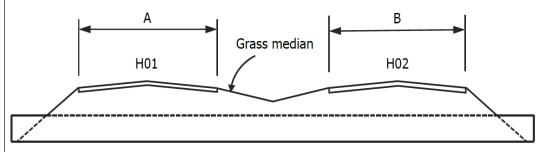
Cross-section view of two highway features carried on the pipe culvert under fill with a grass median.
